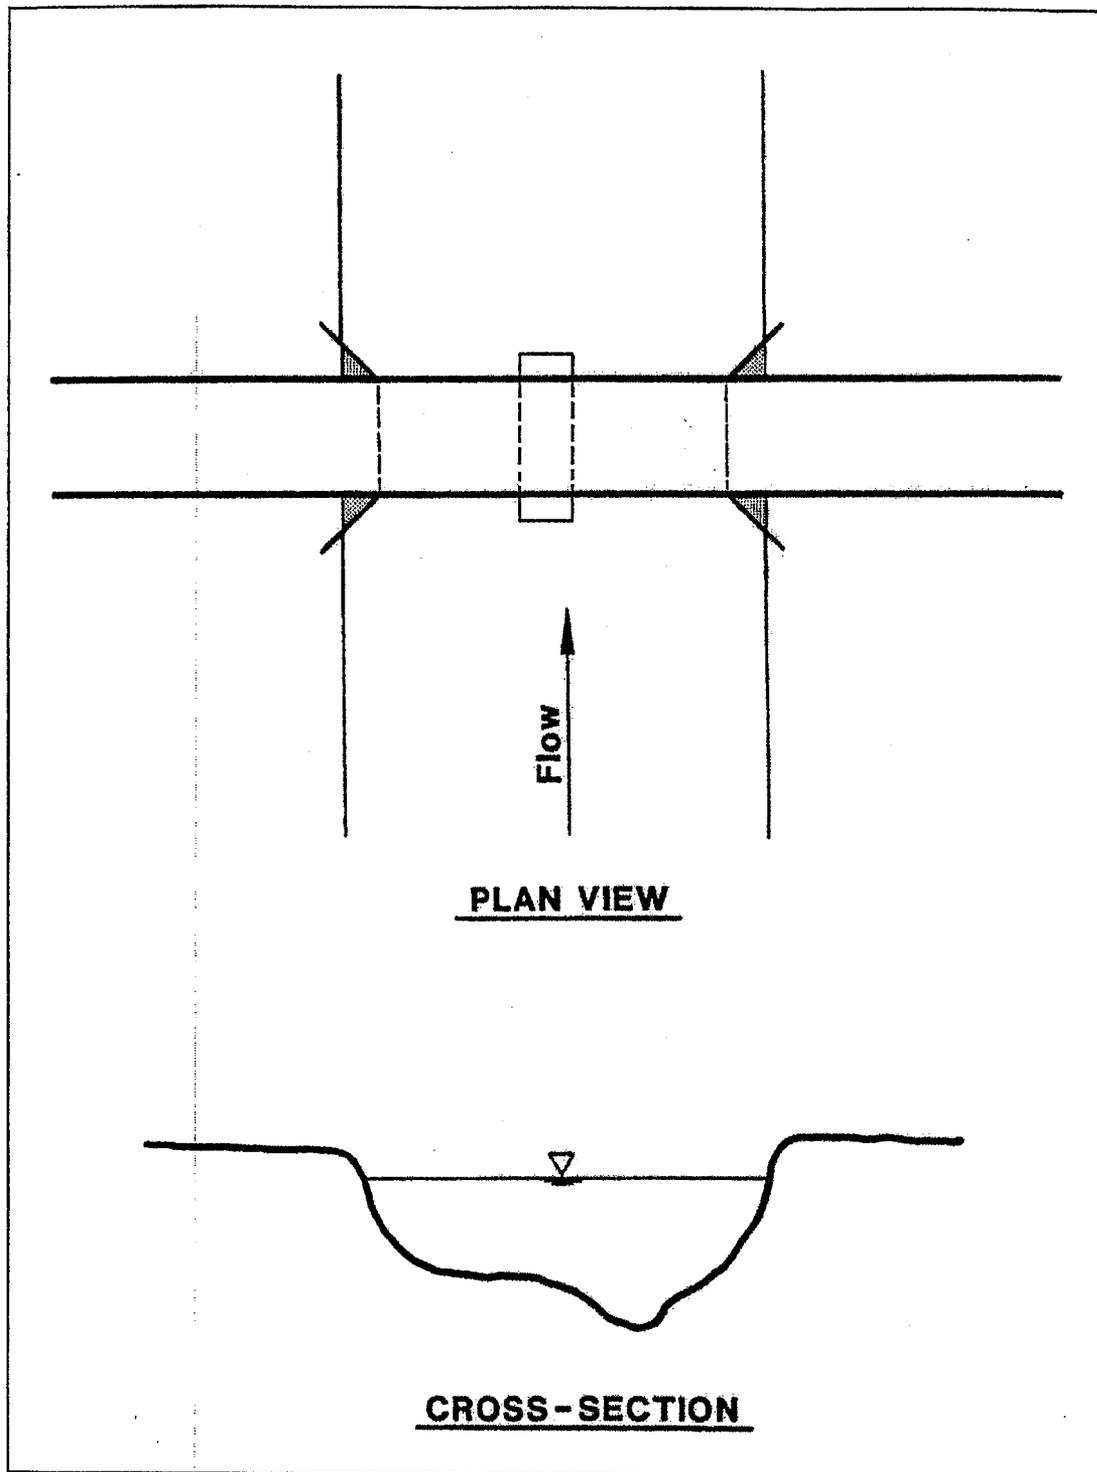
Case 2B: Bridge abutments and/or piers constrict flow.
